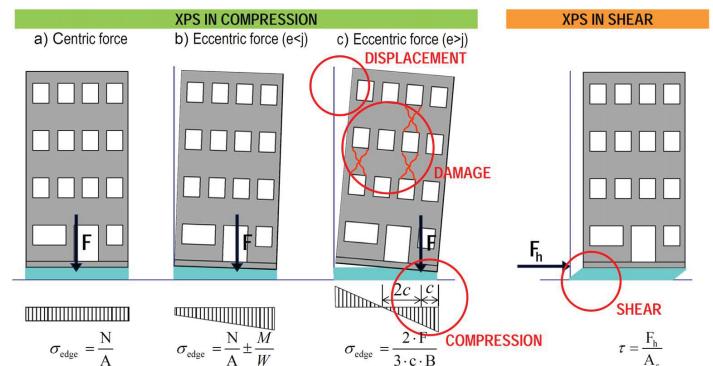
Behaviour of a stiff building structure on a flexible base (e.g. XPS thermal insulation) under the foundation plate
